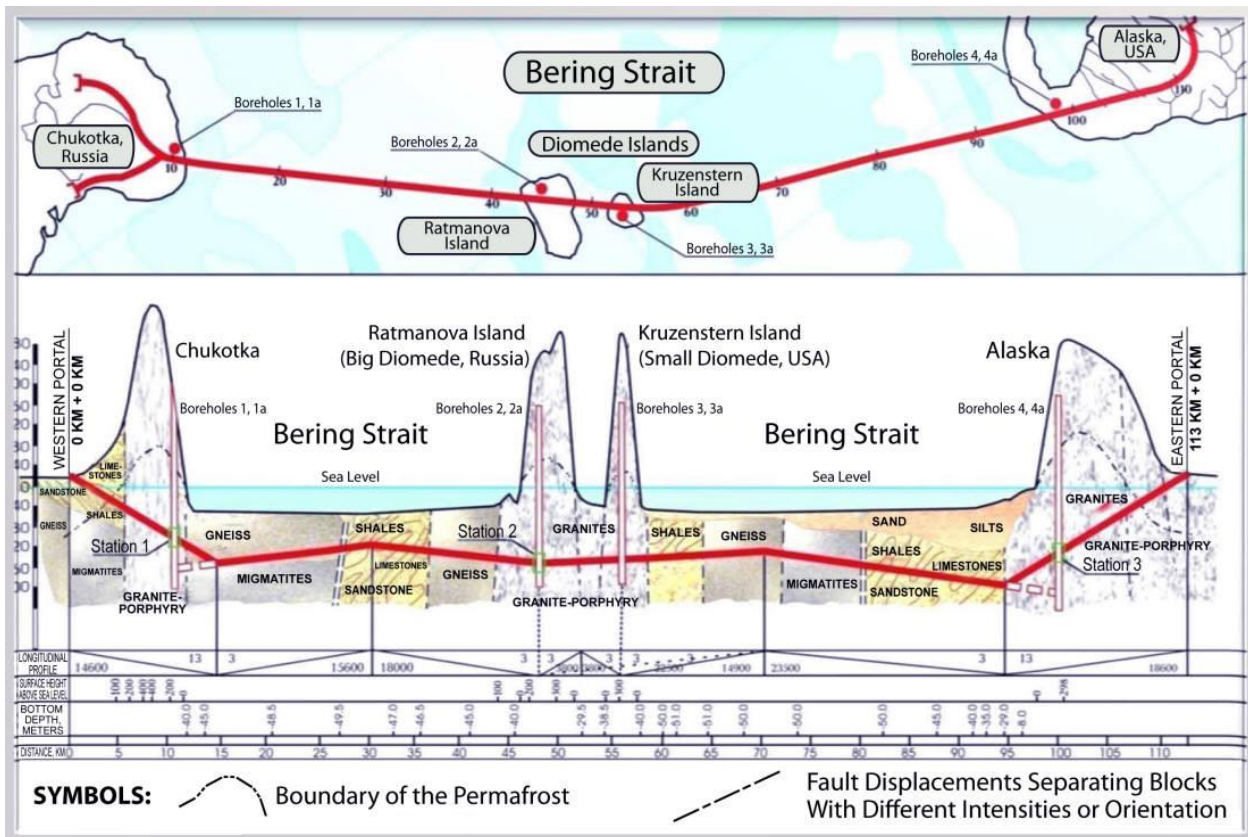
Longitudinal section and layout of the projected tunnel route under the Bering Strait [4]
